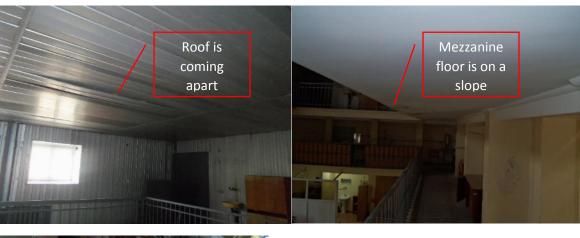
Example space of Approximately 150 m2 with 2 tier mezzanine floor at Chachavadze building, currently used as physics laboratory. The roof has some damage and the top tier of the overhung mezzanine has a distinct lean and what appears to be water damage raising structural concerns. Lights are missing and electrical wiring is old. Windows are also old two pane style.
